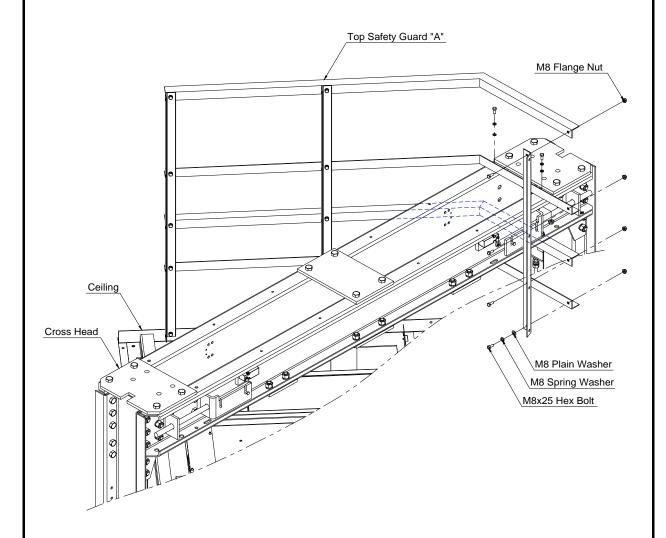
A. CAR TOP SAFETY GUARD (LEFT SIDE) INSTALLATION (Underslung Corner post type)
